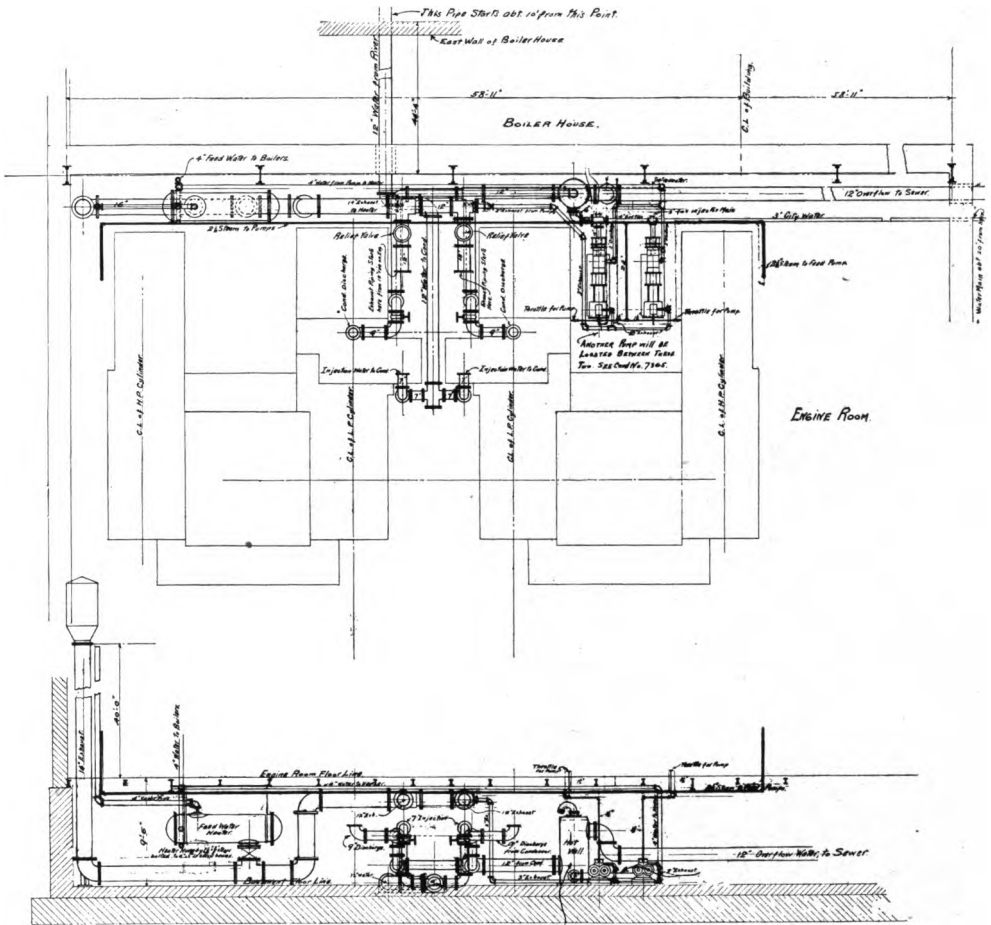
Piping Below Engine Room Floor, Utica Gas & Electric Co.
